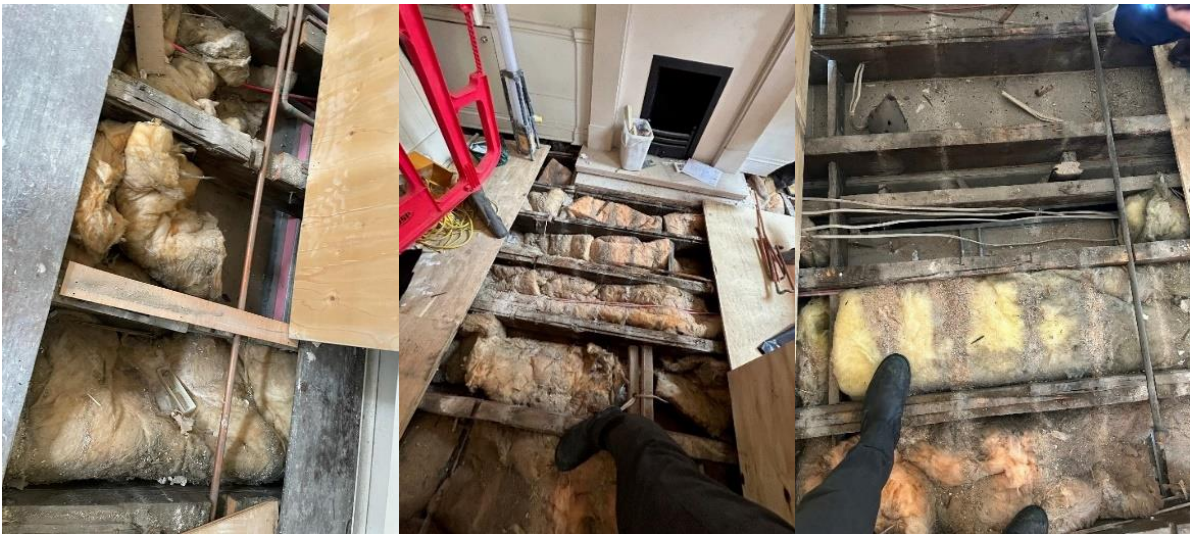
, 02 & 03: Existing floor levelling attempts illustrating firrings and a combination of timber laths to the existing joists.
